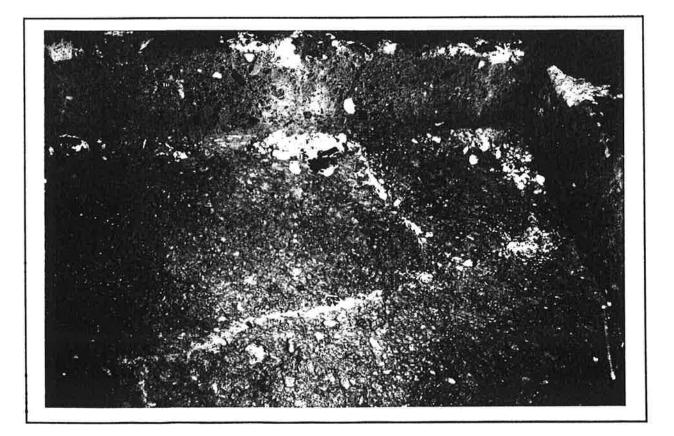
REMOVED SECTION OF DRIP PAD SHOWS UNDERLYING SOIL
